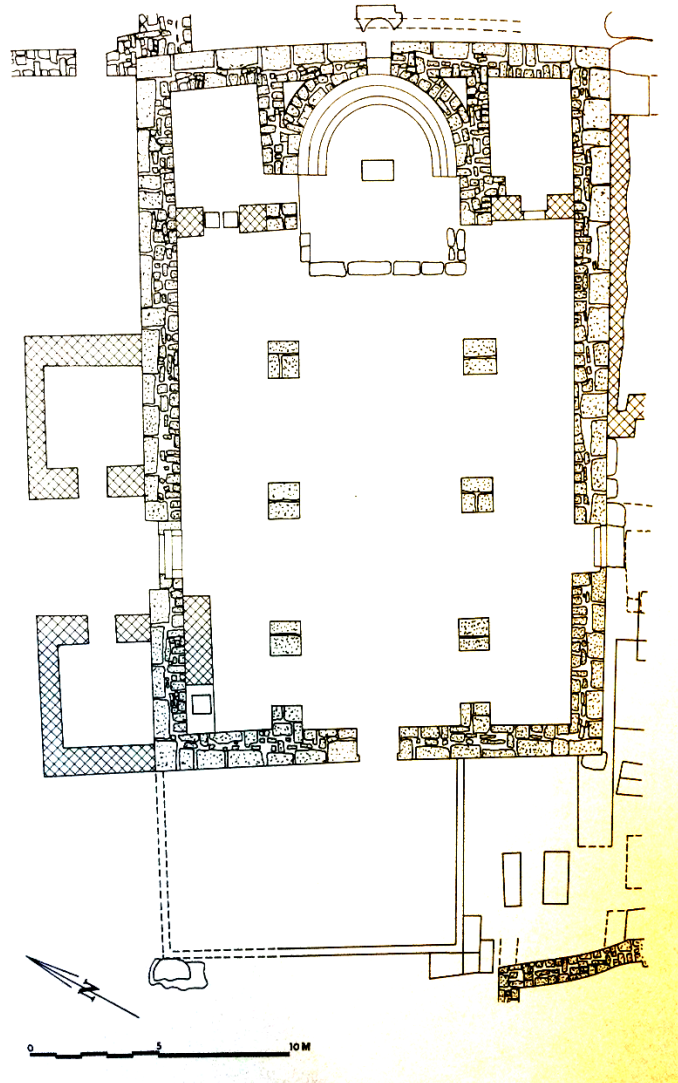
Plan of the Monastery Church of St. Barlaam (Djobadze, 1986: plan d)
